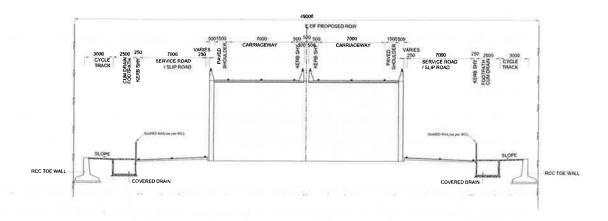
Typical Arrangement of Spur to Bahadurgarh from Jharoda Kalan- Tikri Kalan cross road till Bahadurgarh-Najafgarh Cross Road.
